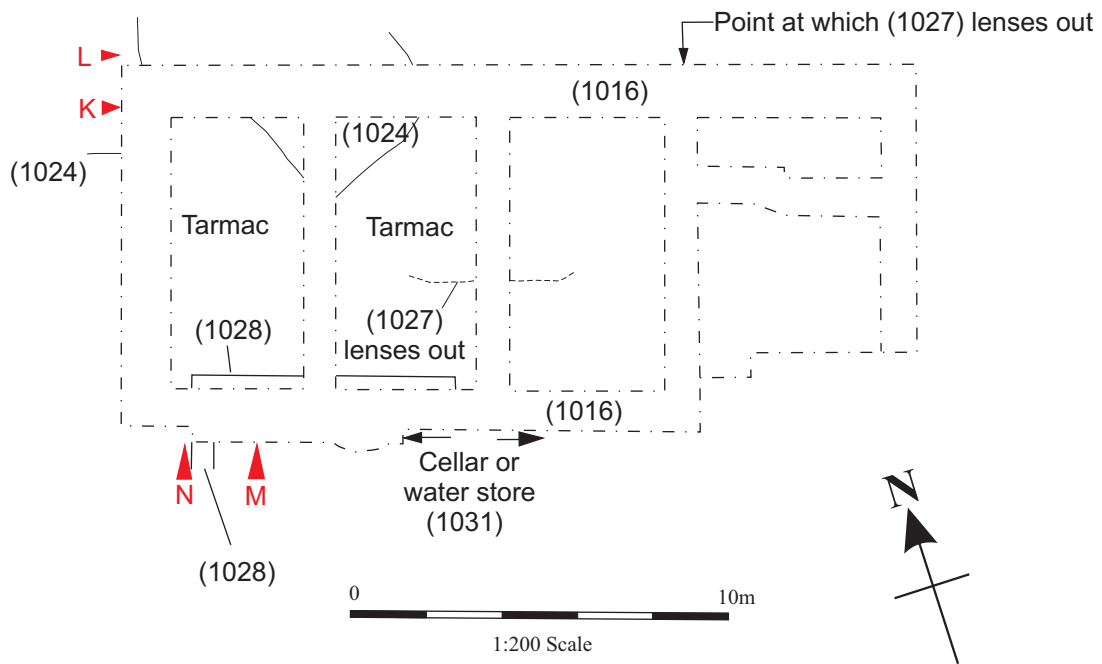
(above): Plan of Plot 2 showing excavated garage footings
